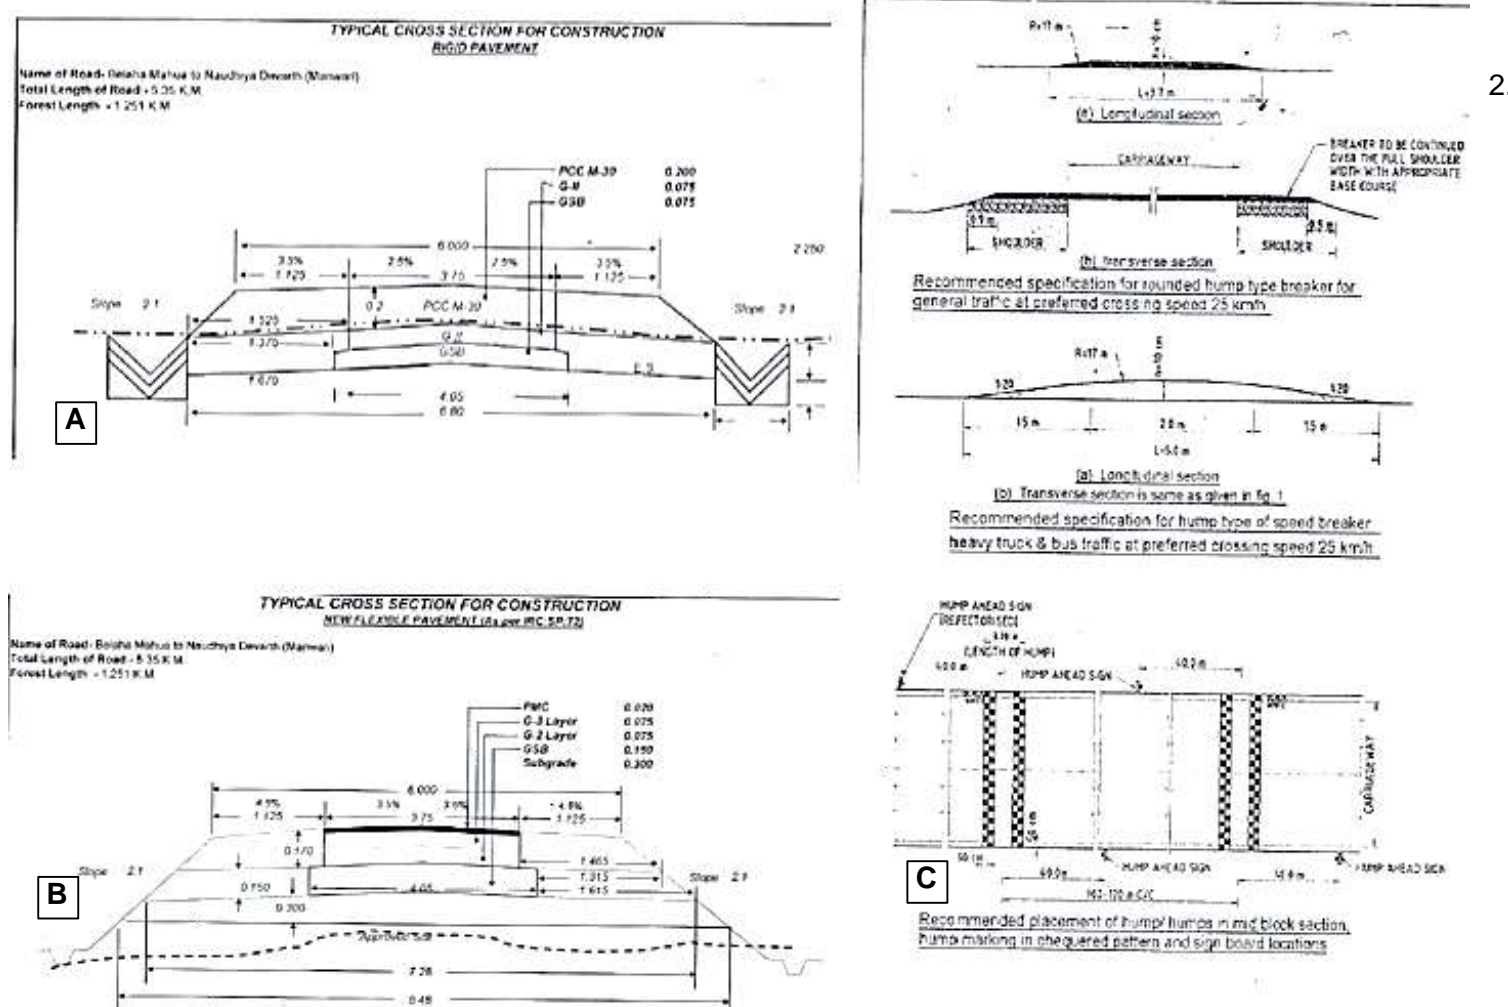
A. Cross Section for Rigid Pavement, B. Cross Section for Flexible Pavement, C. Recommended Specification for Humps (Source: Report on a 5.35KM PMGSY Road Constructed in Belaha Mahuva, Siddi, MP)
